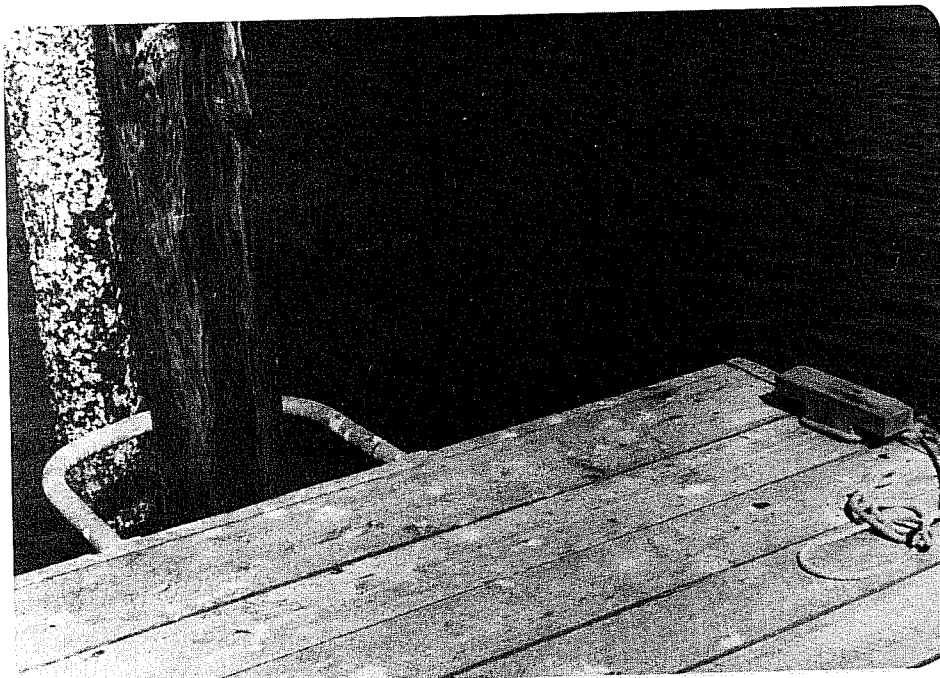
Float and Timber Pile Attachment and Wooden Mooring Cleat.
